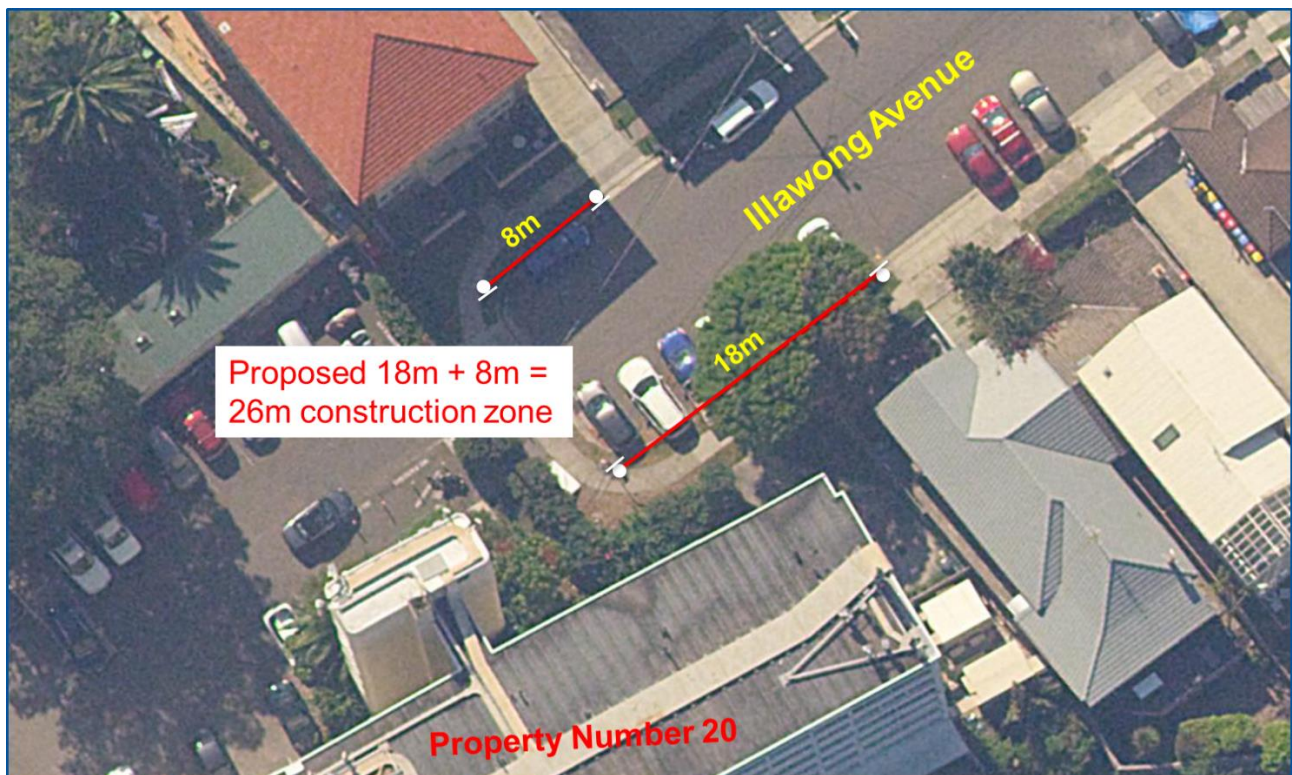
Proposed construction zone on Illawong Avenue fronting number 20
